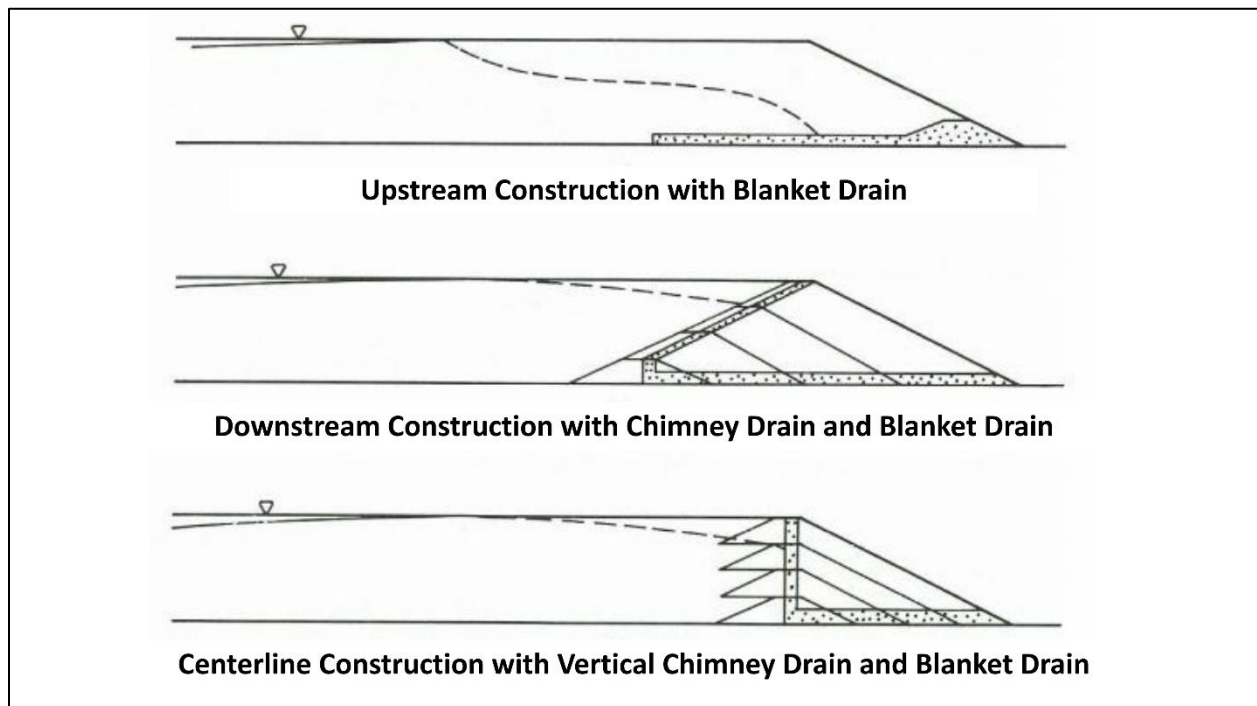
It is possible to install blanket drains using all three construction methods, although chimney drains can be installed using only the downstream and centerline construction methods. These drains lower the water table and reduce the likelihood of internal erosion of the dam (see Fig. 7), seismic liquefaction of the tailings, static liquefaction of the dam or tailings deposit, and failure of the foundation under the tailings. Figure modified from (1990).
